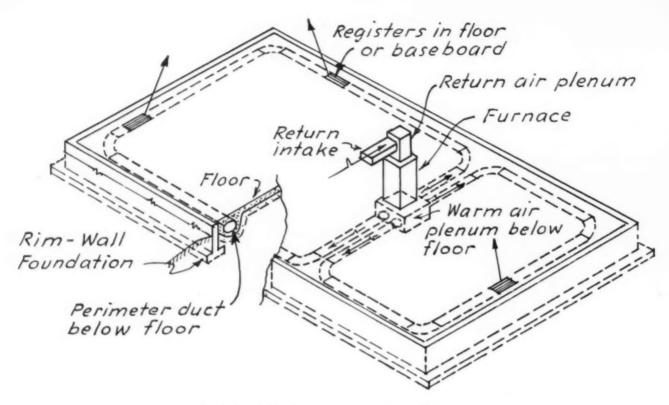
Sketch of perimeter warm air system. (House construction above floor not shown.)
